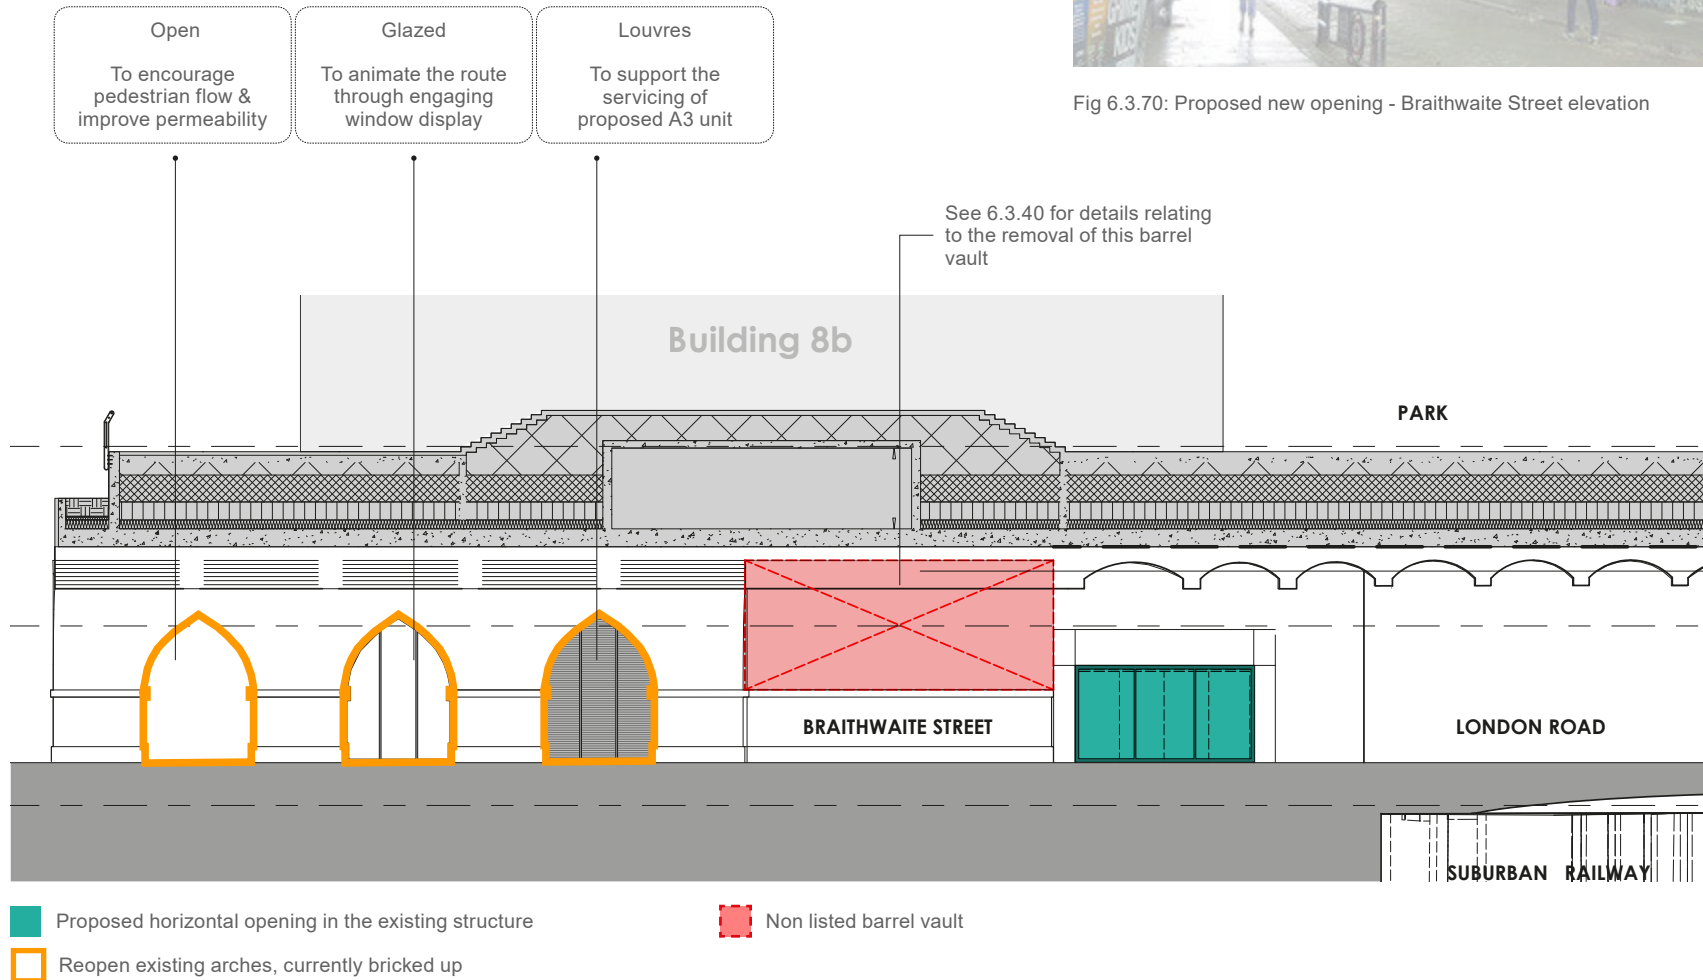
Proposed new opening - Braithwaite Street elevation
